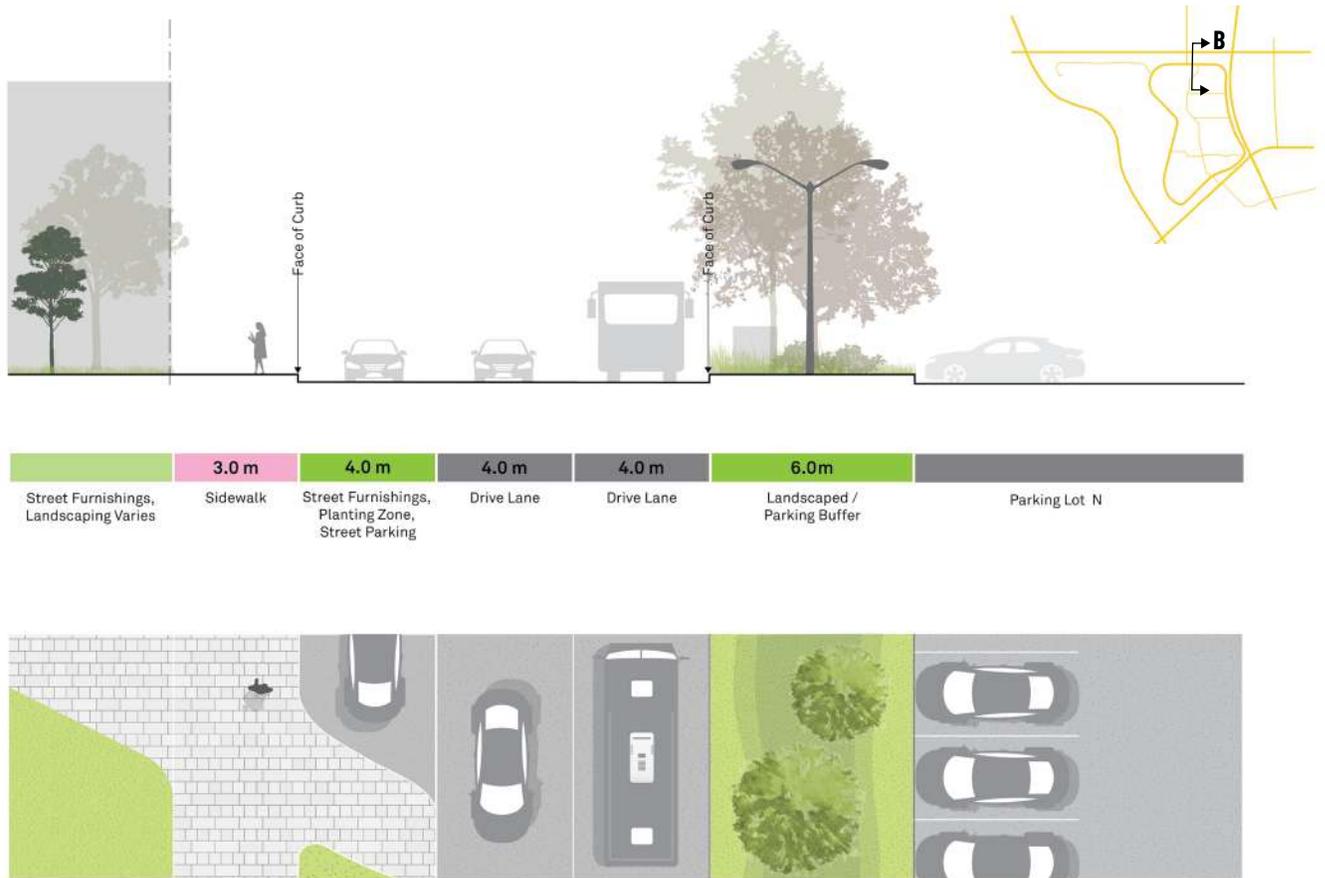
Section B. Existing condition of Ring Road (northern edge).
